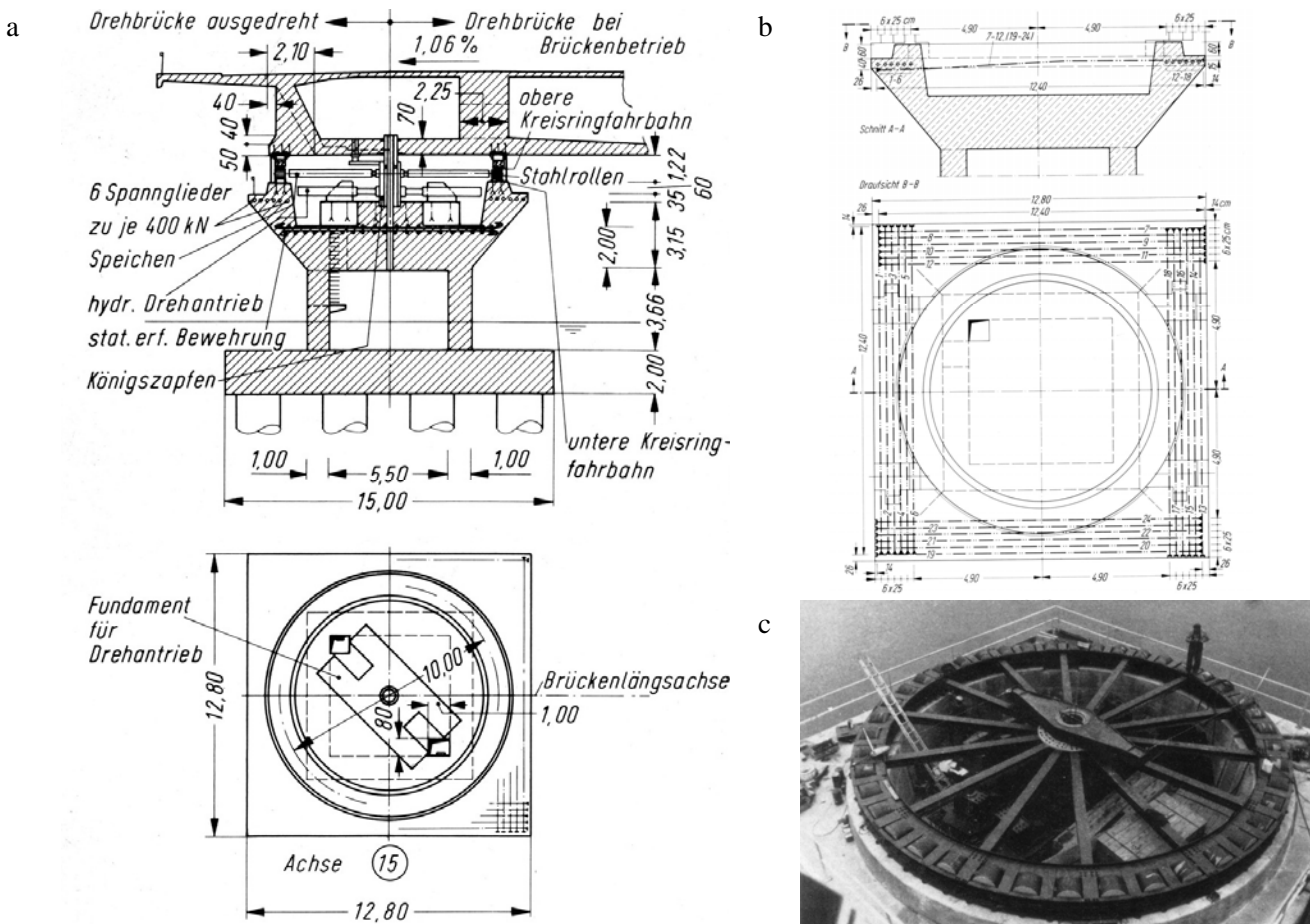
Main pier: Layout, b) Prestressing of the pier table, c) Turning circle
